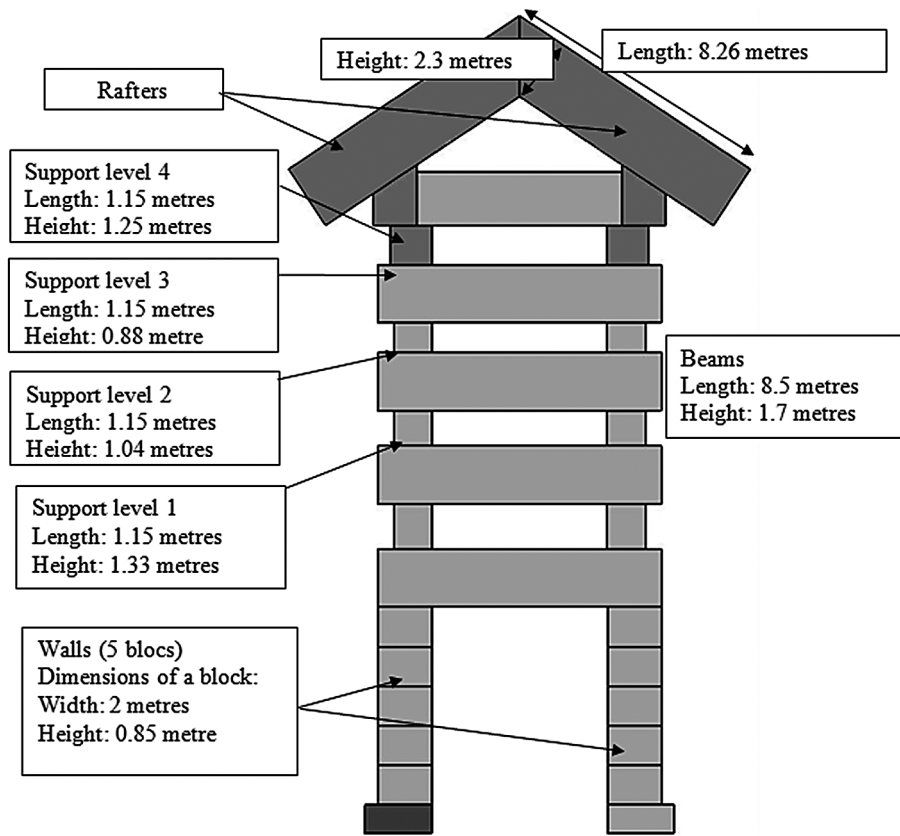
Complete assembly of the Burial Chamber, with dimensions.
